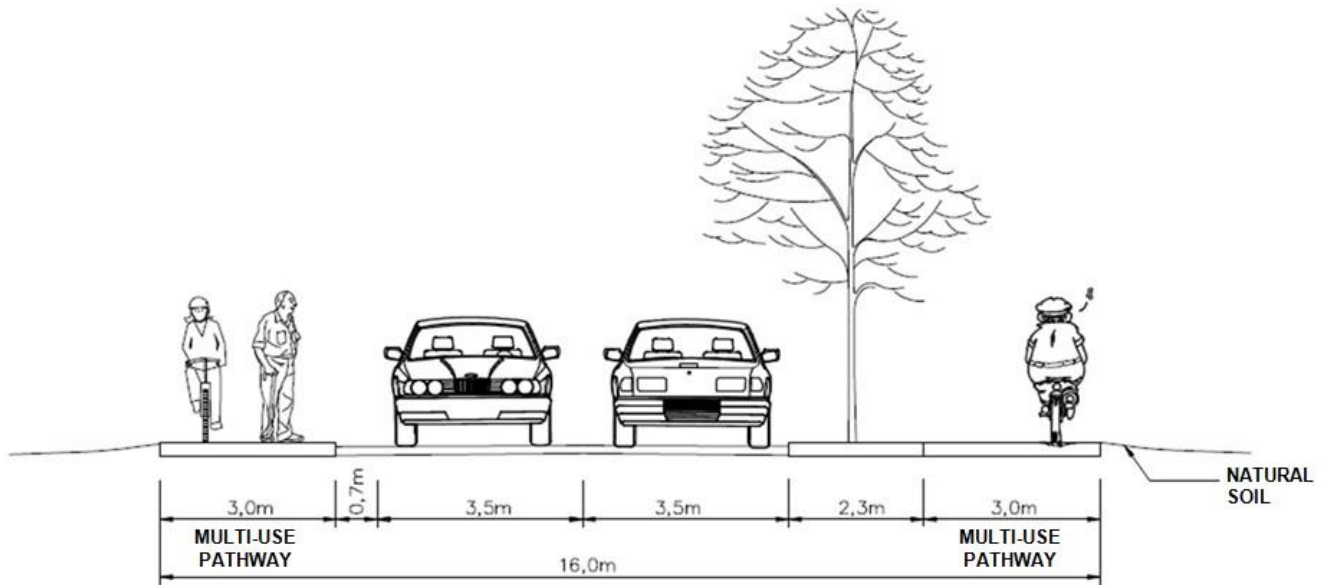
Proposed Cross-section for Old Chelsea Road – East of Highway 5
